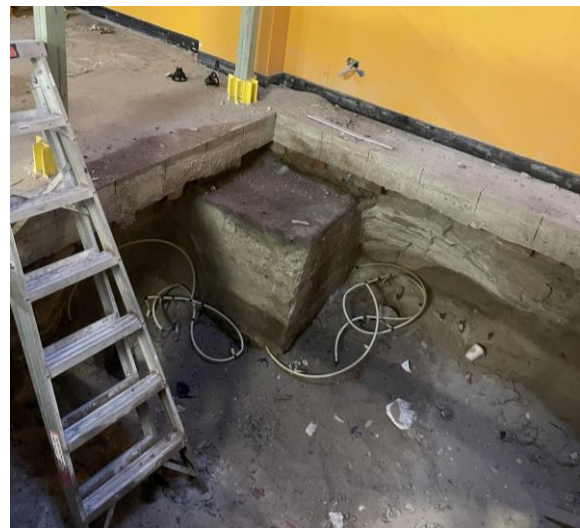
The bottom of the elevator shaft showing the concrete pier pad
